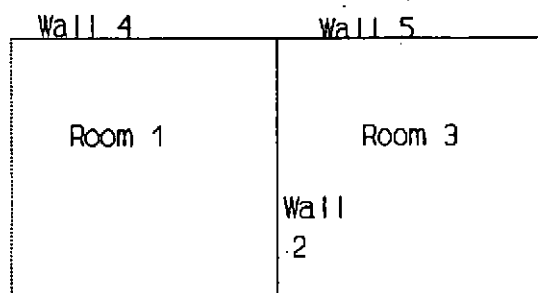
Layout of two rooms separated by a common wall with an external flanking wall.
